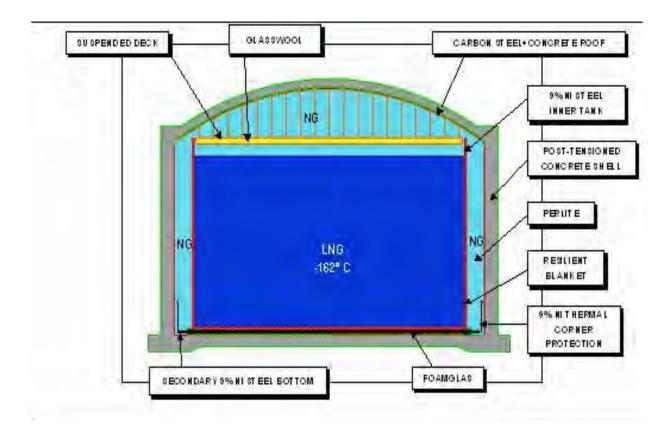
FULL CONTAINMENT LNG STORAGE TANK
